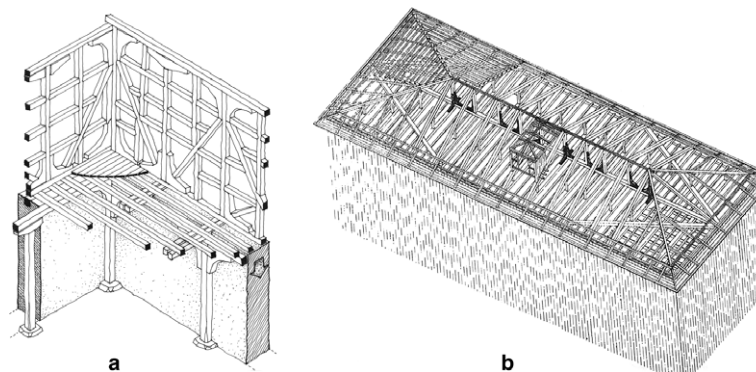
Typical construction of (a) intermediate floor and (b) roof.
